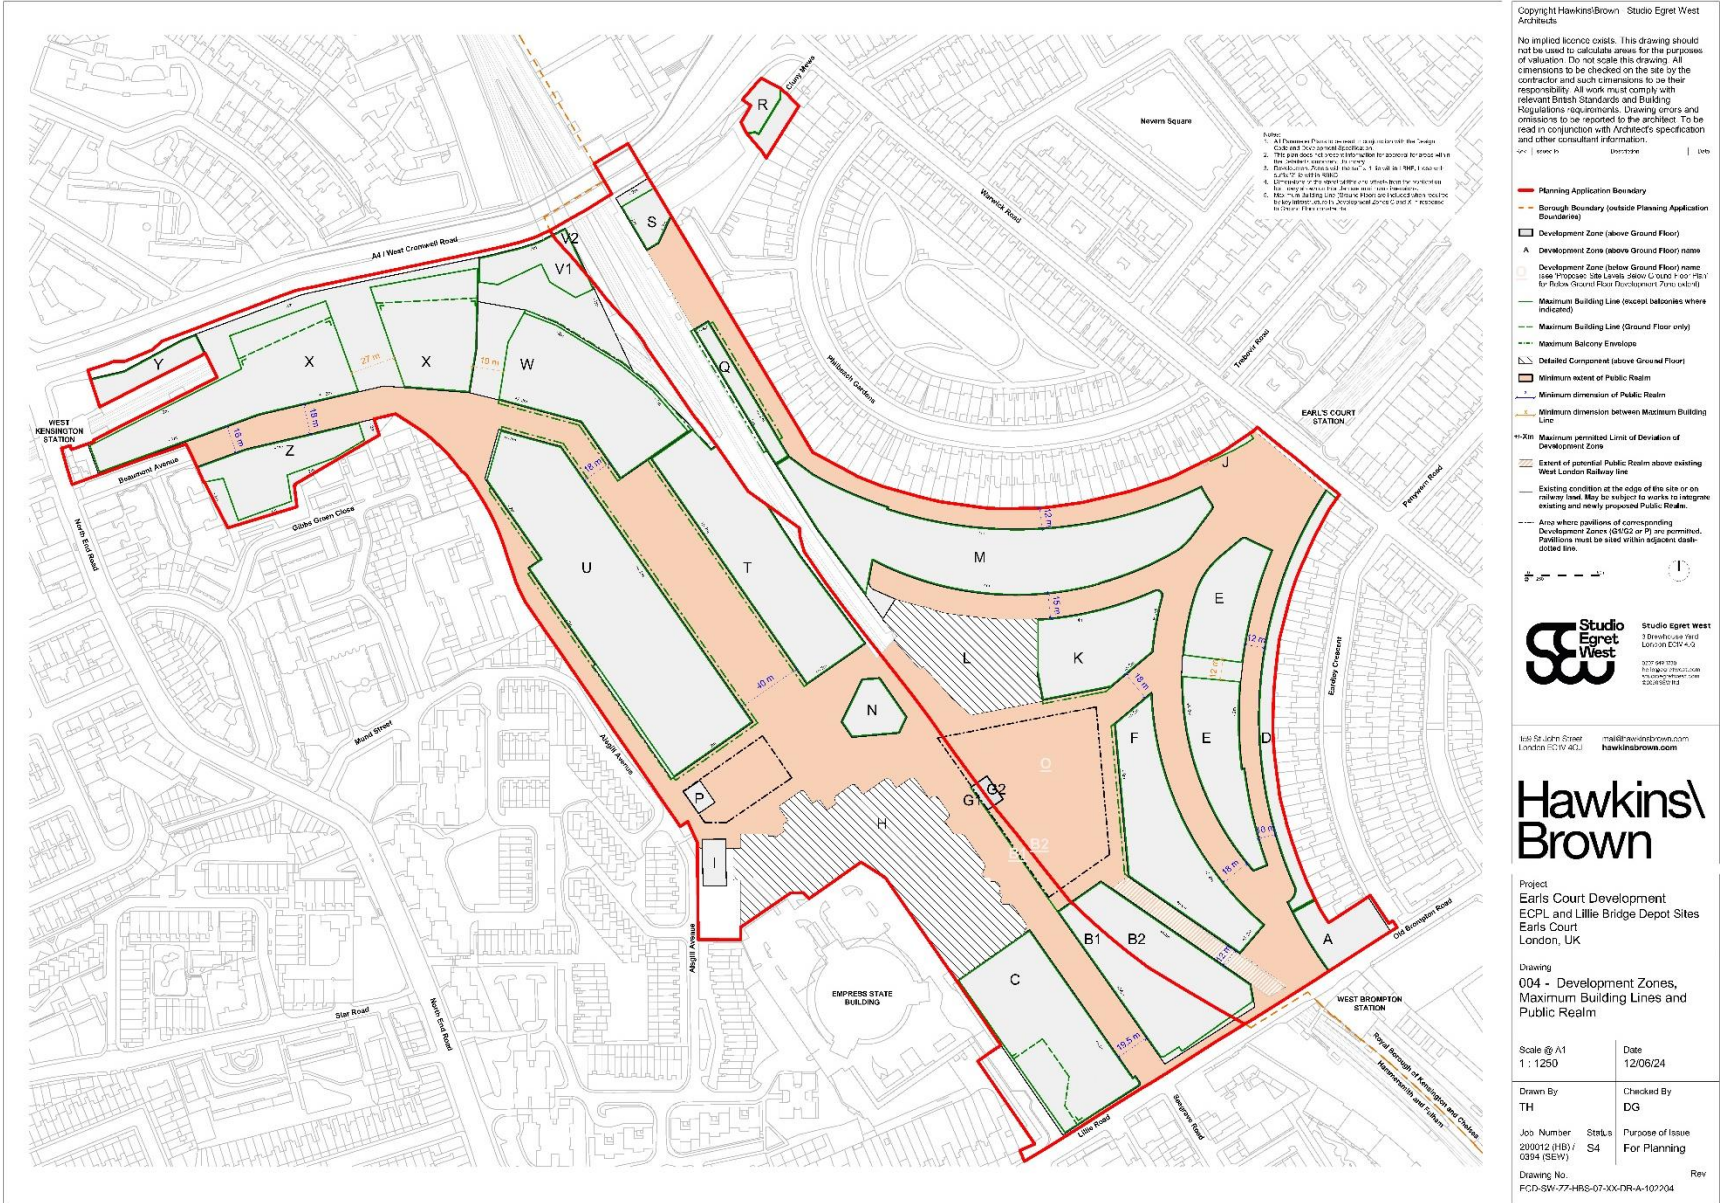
Proposed Development Zones, Maximum Building Lines and Public Realm Parameter Plan
